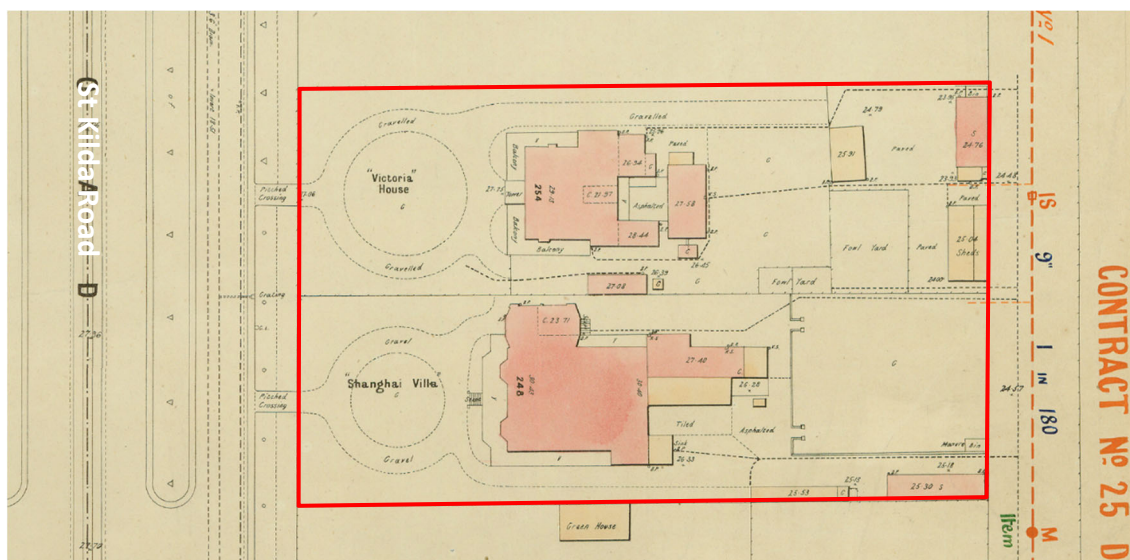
An extract of a Melbourne & Metropolitan Board of Works Detail Plan, dated to 1896, showing two villas with gravelled turning circles. (Source: MMBW Detail Plan nos 642, 643, 902, 903 and 905, 1896, State Library Victoria)
